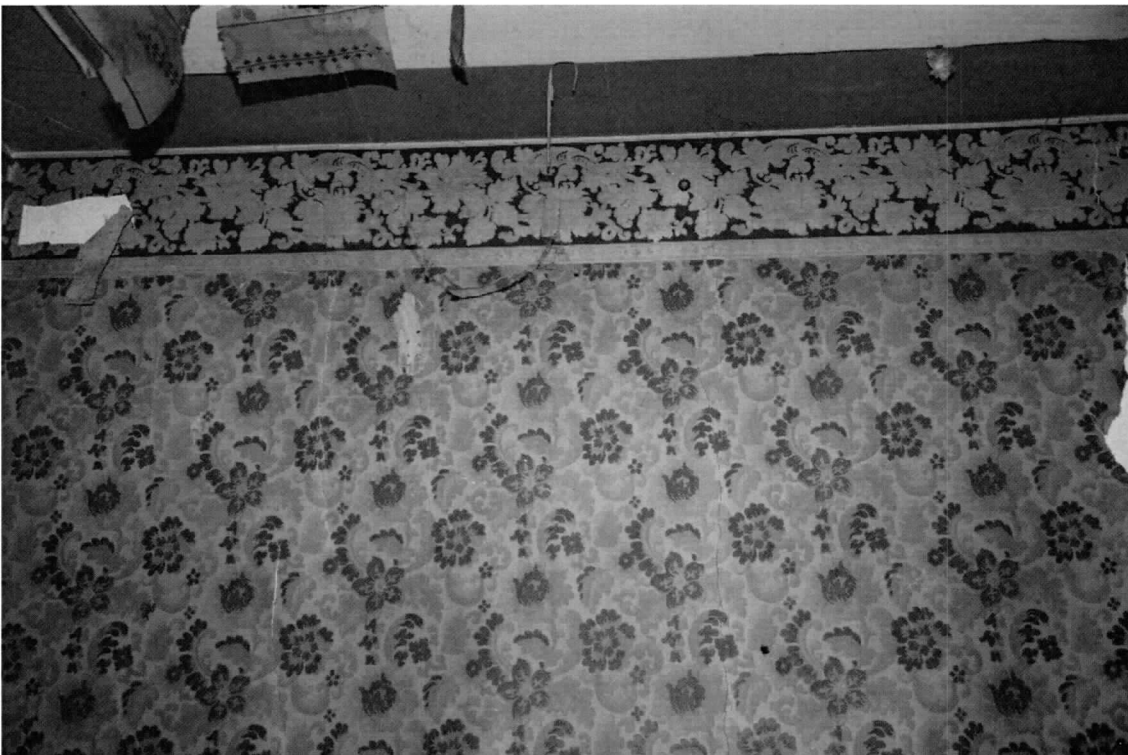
of 24: West room wallpaper and ceiling borders. 11/16/2016
